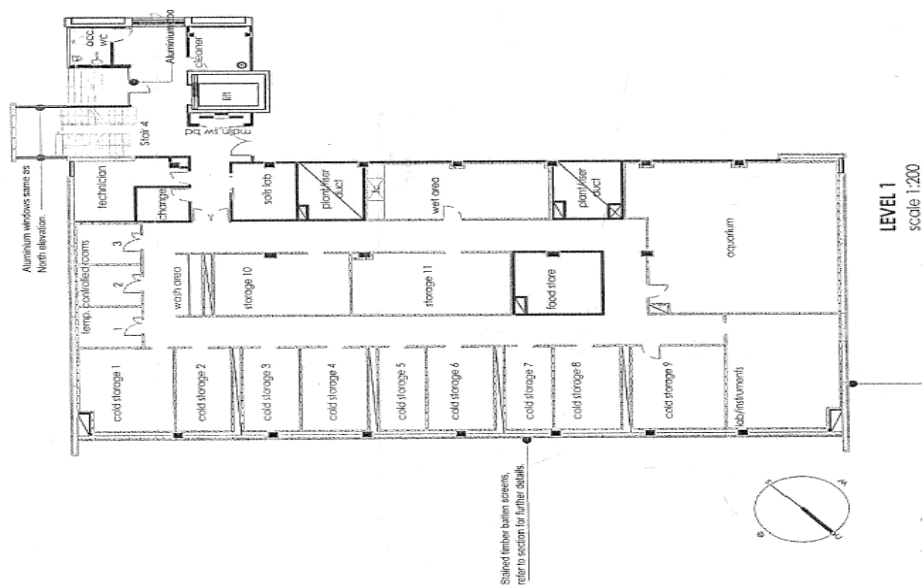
Architectural layout of the original concrete building at Level 1. Reproduced from Dalman Architecture Ltd drawings.
